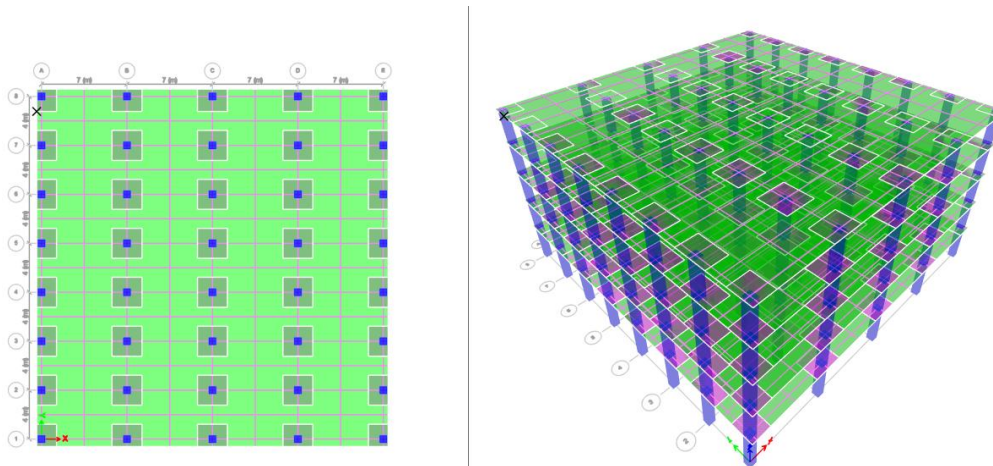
The plan and isometric view of the flat slab with square drop panels.
